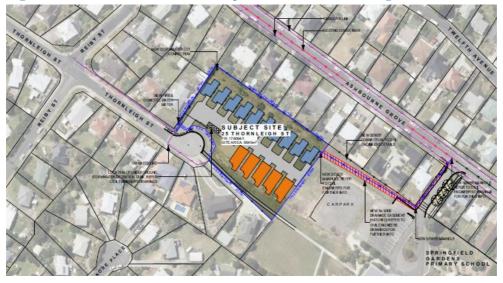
Aerial view of site – 25 Thornleigh Street, West Moonah
